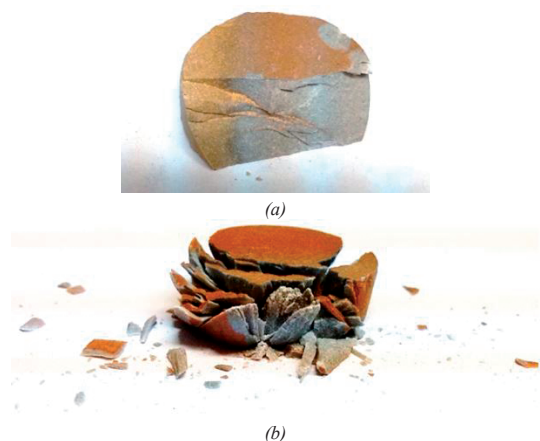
Typical fracture surfaces of specimens after shear test (a) and pressure test (b)
